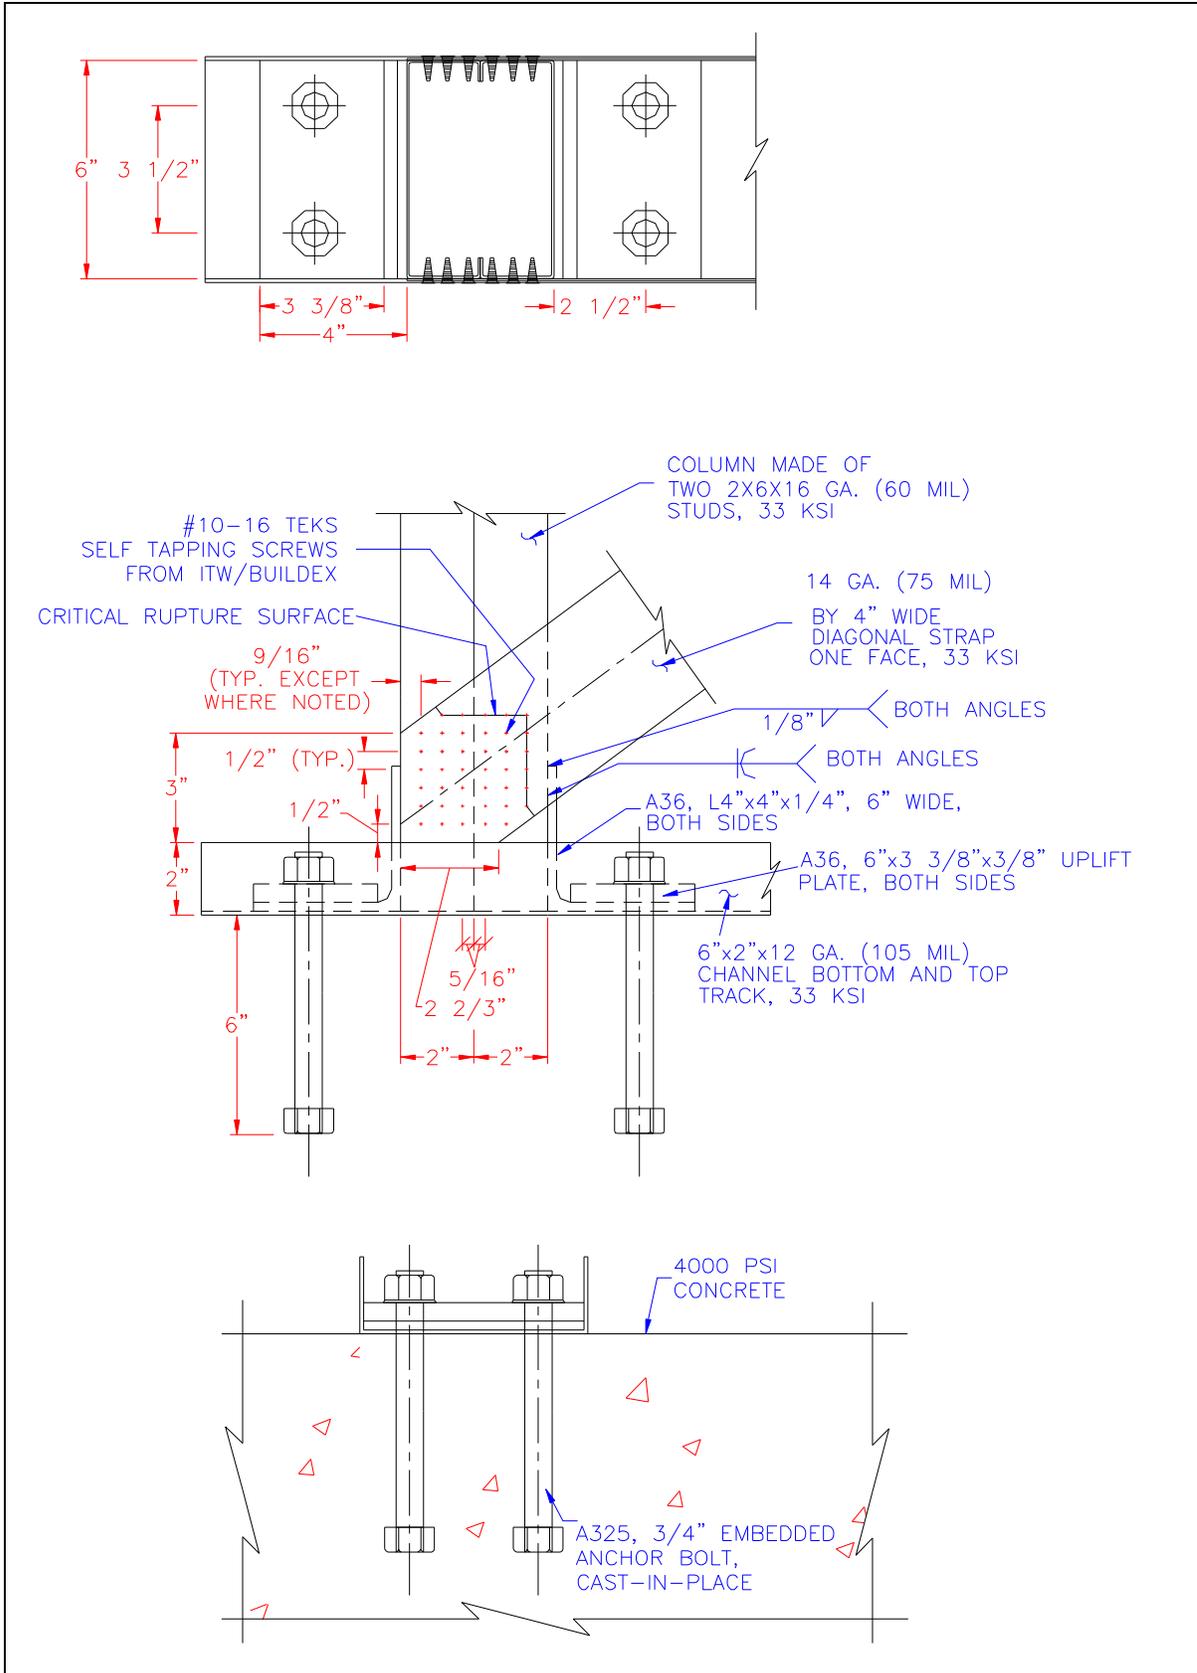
Example connection/anchorage detail – 1st row of Tables D-5, D-8 – D-17.
